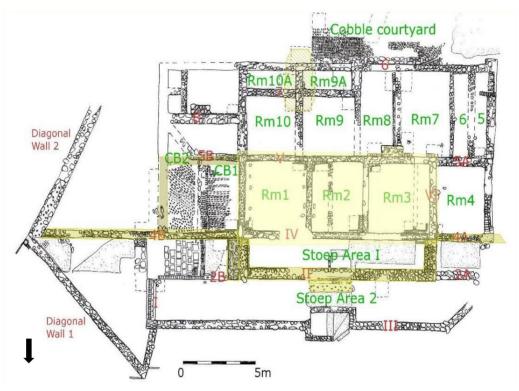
Detail of Site Plan 2 showing Phase 2 construction of the dwelling.
